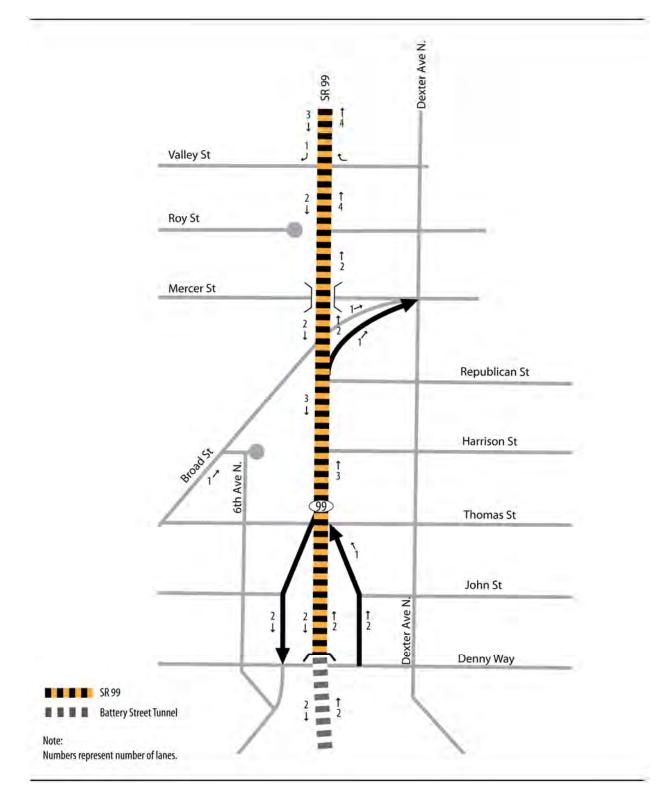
Bored Tunnel Alternative Traffic Stage 5 Roadway Configuration (North)
